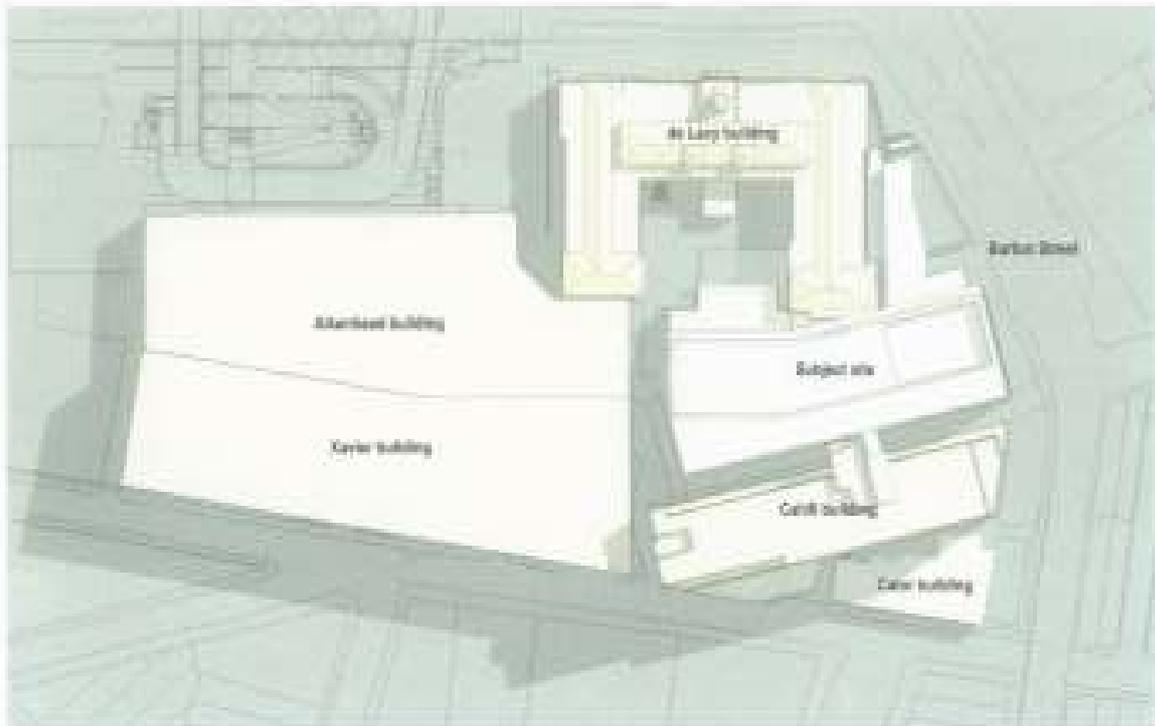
Site layout in conjunction with the St. Vincent's Hospital campus. The new O'Brien building is shown in white.
